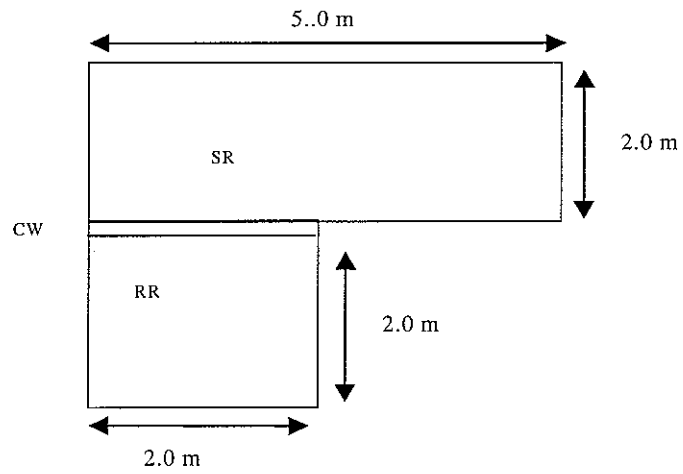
Room plan shapes; RR (Receiving room); SR (Source room); CW (Common wall)
